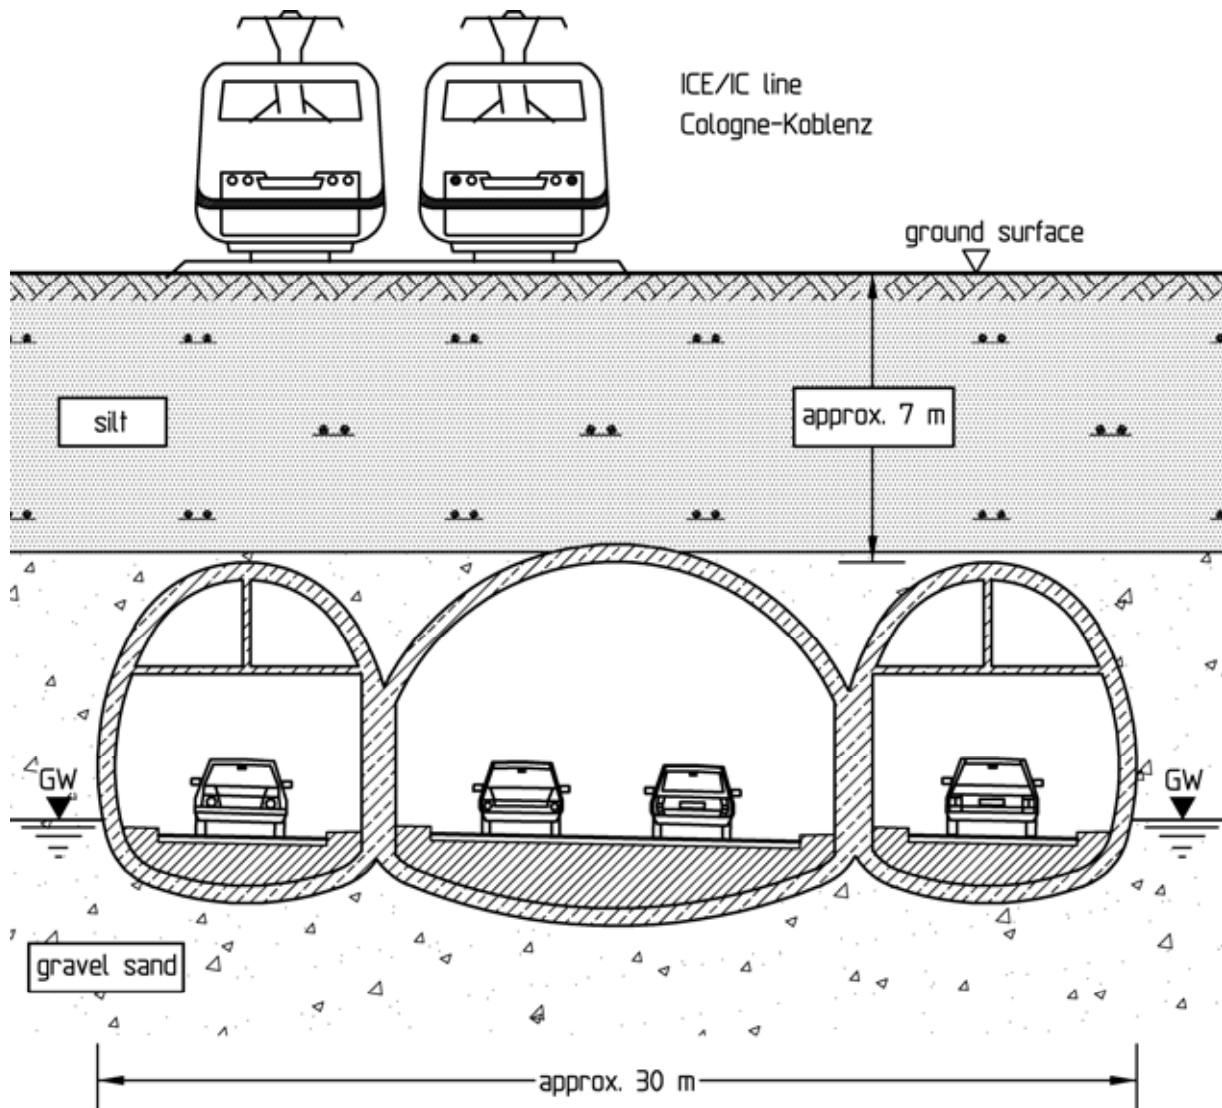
Tunnel tube divided into three sections, cross-section
